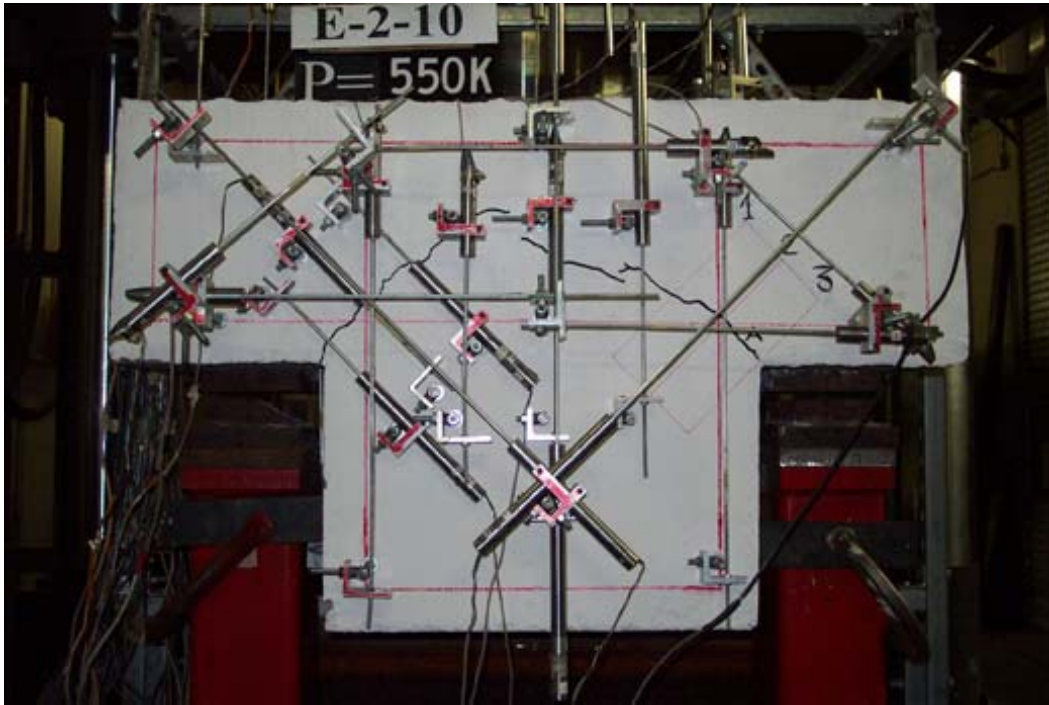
(c) Diagonal cracks in Specimen E-2-10
